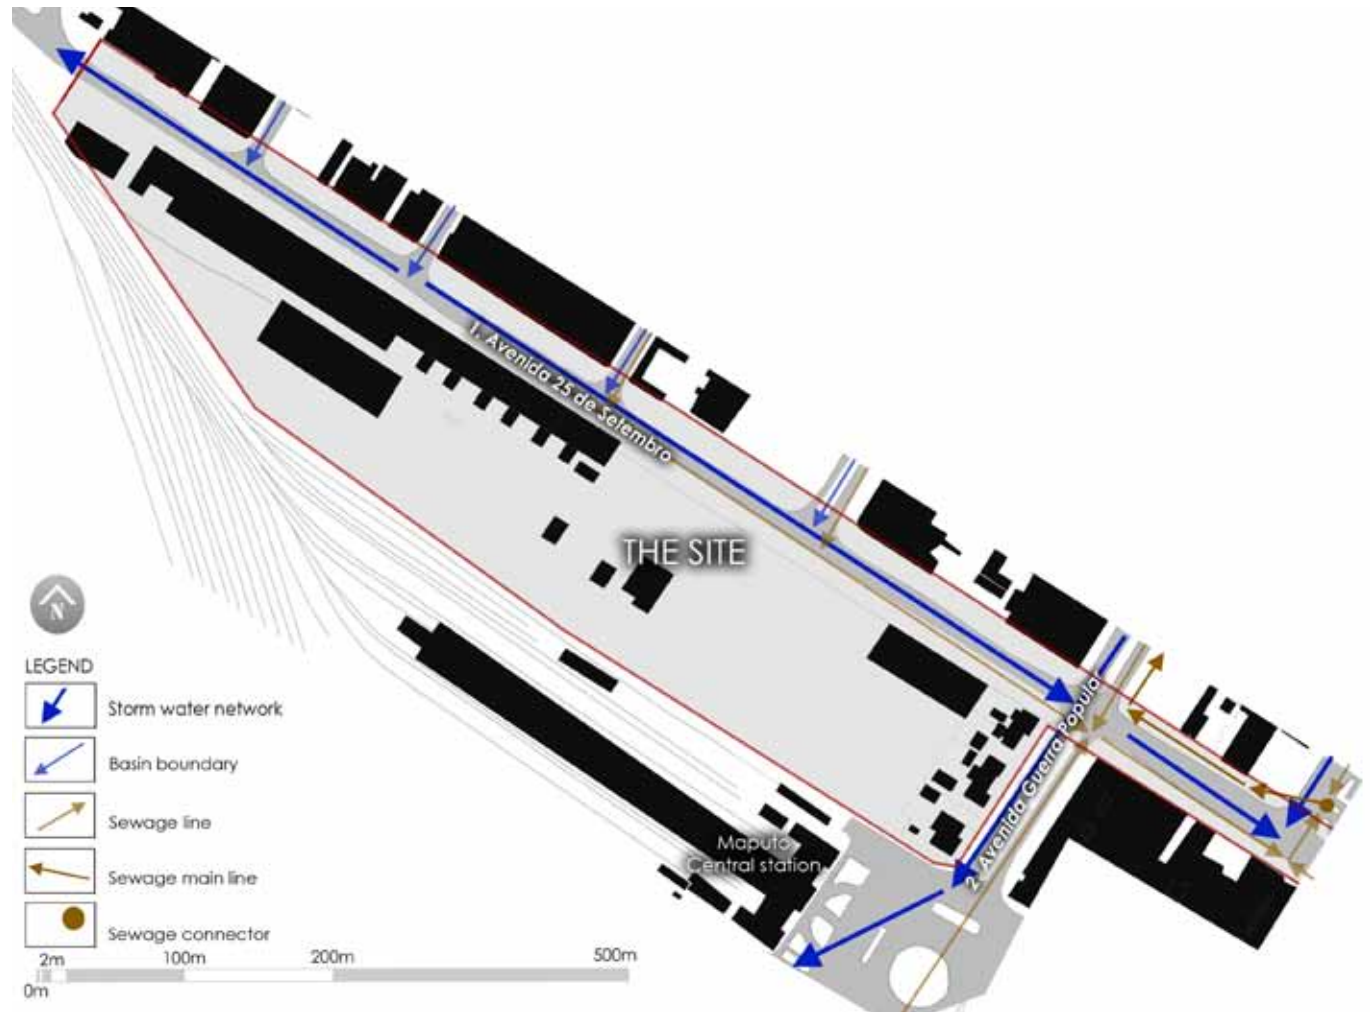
SITE SERVICES AND RESTRICTIONS ON PROPOSED SITE (AUTHOR, 2011)
